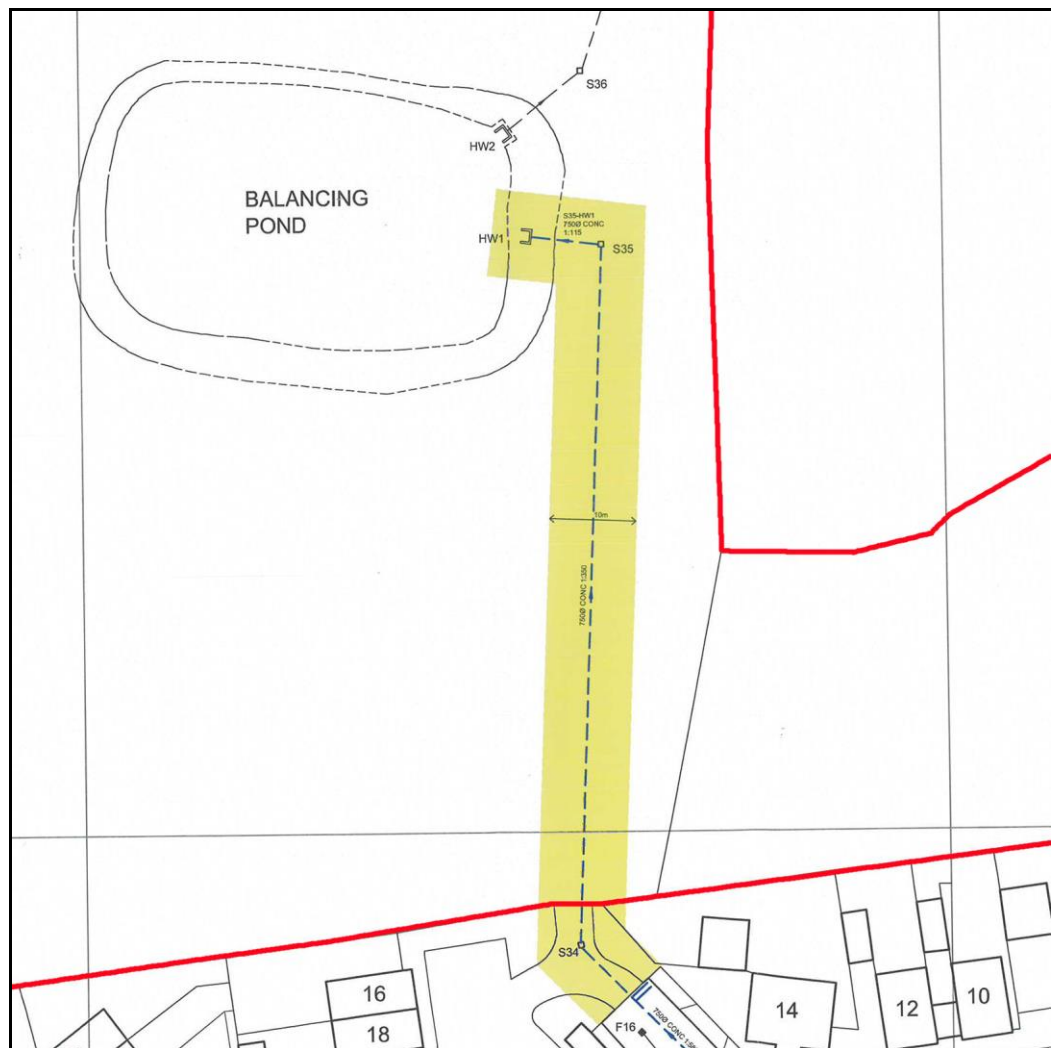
Existing surface water connection to the on-site attenuation pond, with the site edged red.
